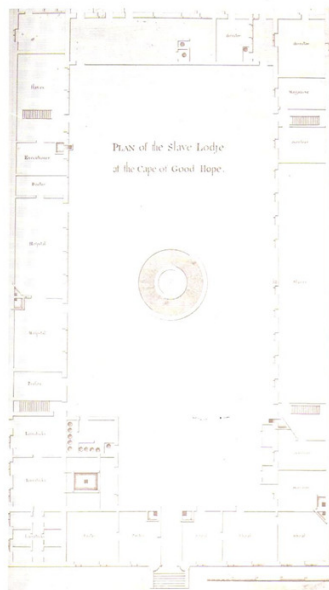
Left: Plan to convert the slave lodge into Government house (Oberholster 1972:11).
